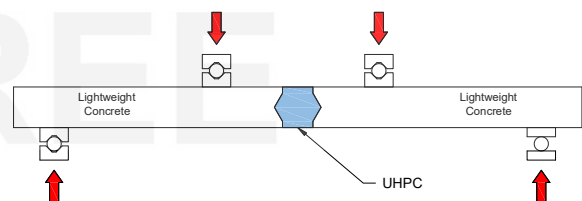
Preliminary test configuration of bridge deck joint specimen.
